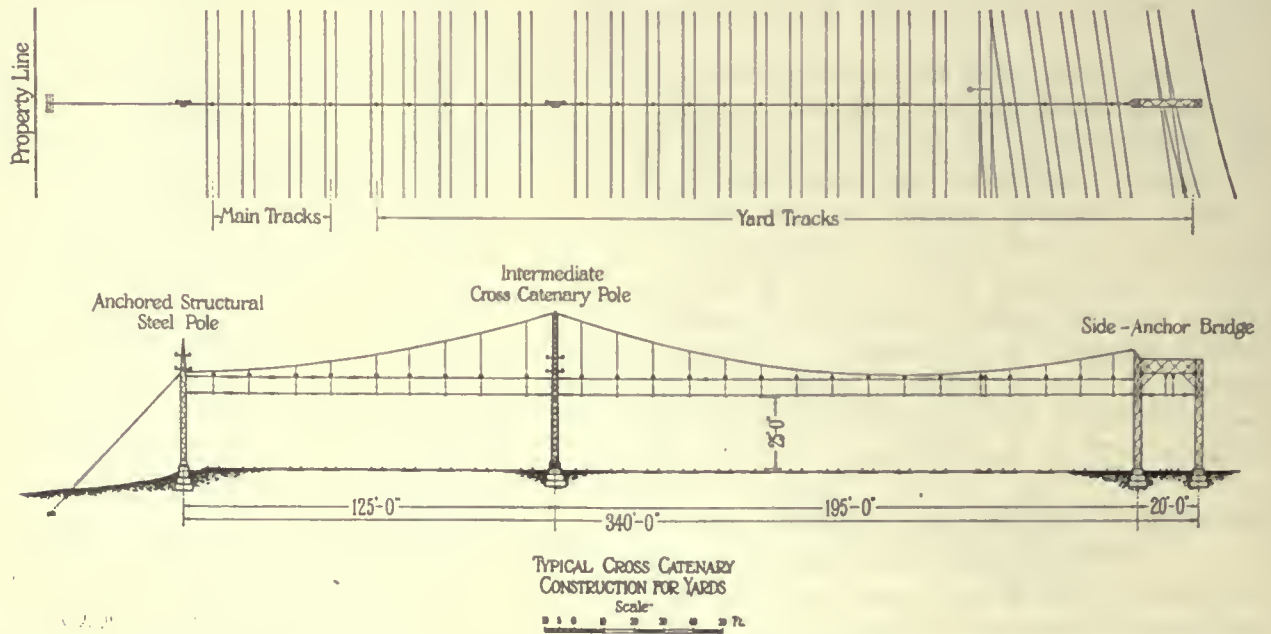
TYPICAL CROSS CATENARY CONSTRUCTION FOR YARDS, SHOWING ANCHORED END POLE, INTERMEDIATE POLE AND SIDE ANCHOR BRIDGE IN PLACE
